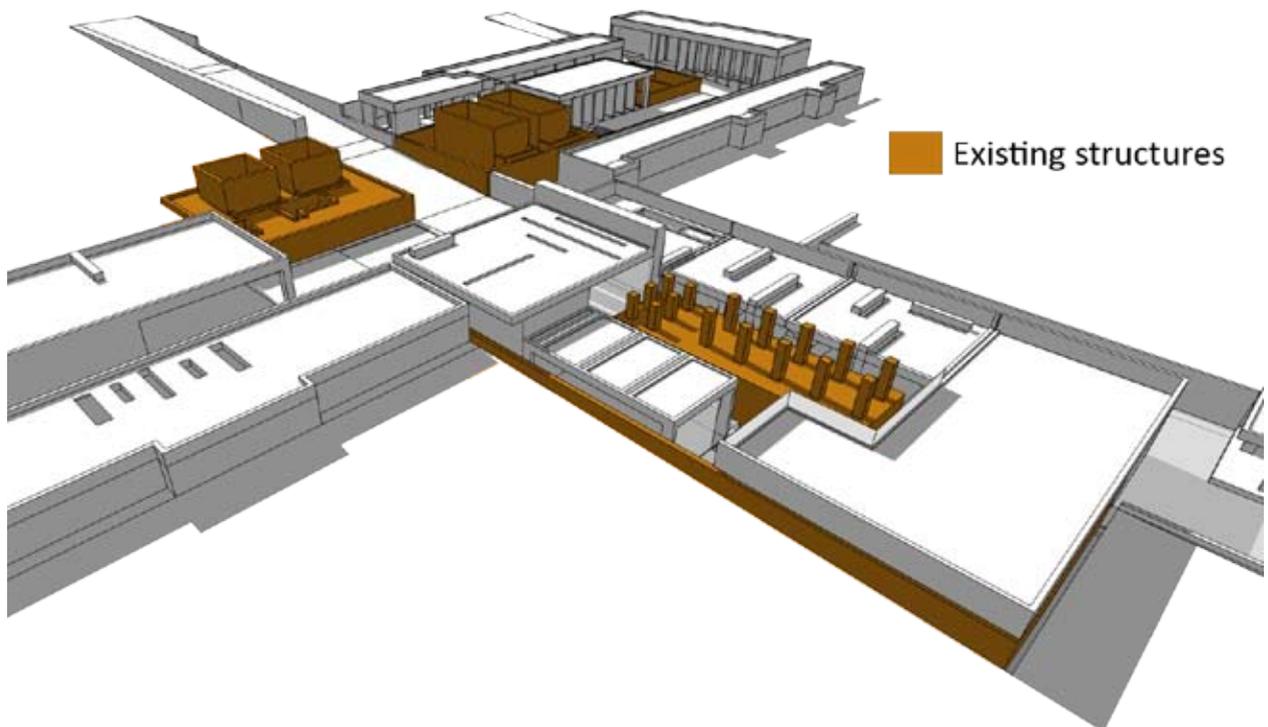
Illustration of existing structures in relation with the proposed intervention
